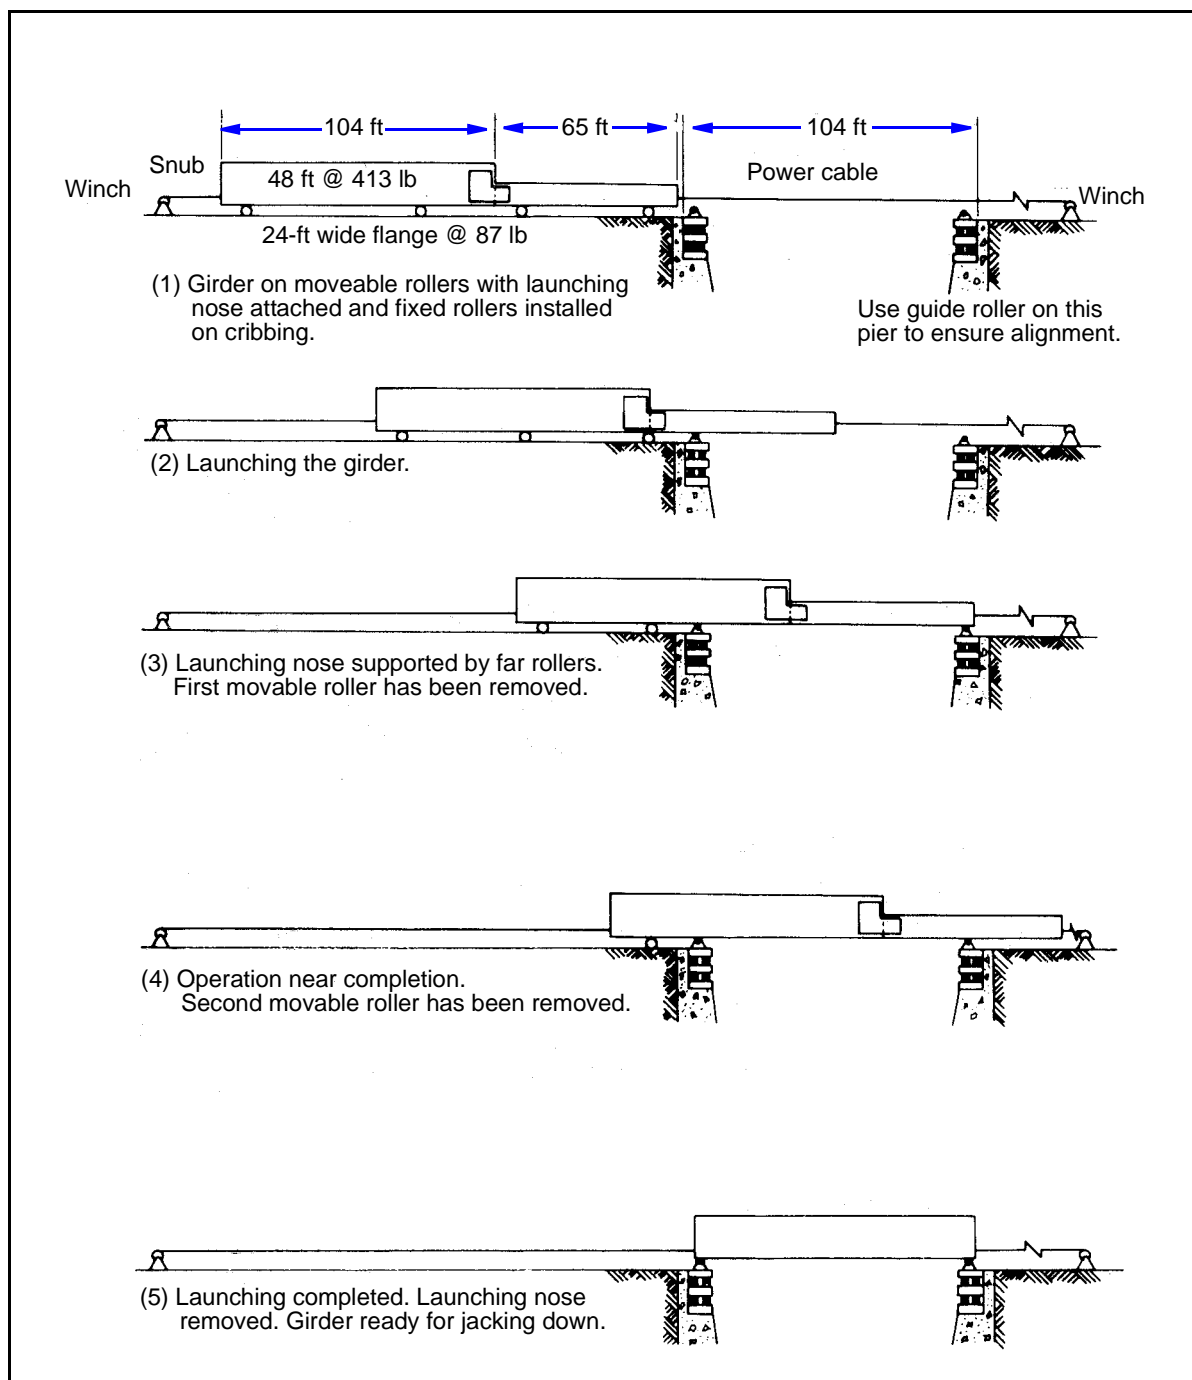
Launching Heavy Girders with a Light Launching Nose
